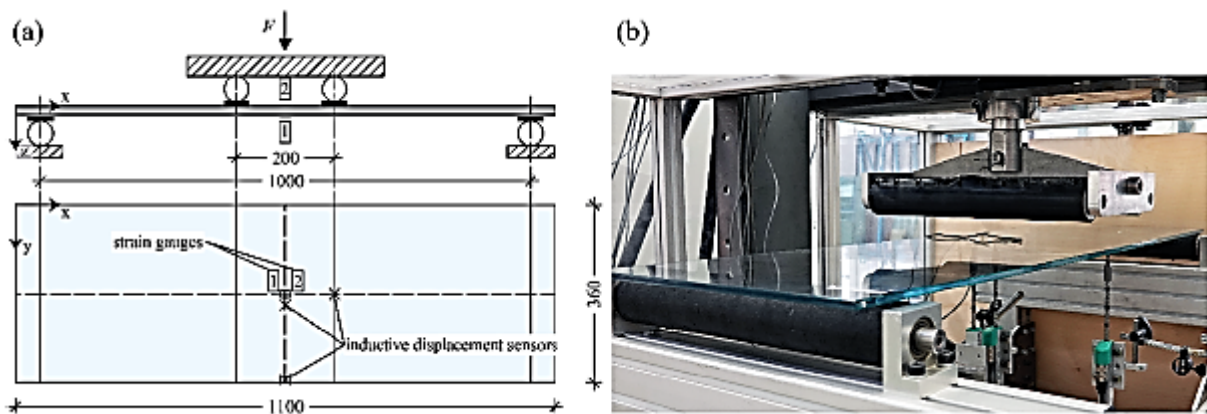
An illustration of 720a four-point bending test with dimensions in (mm) and measurement (a) and test rig image (b) (Hänig and Weller, 2021)
